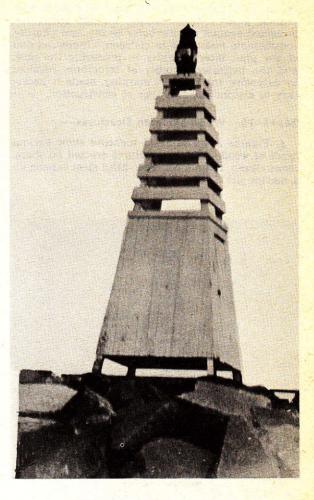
Wooden minor light structure on stone riprap.
